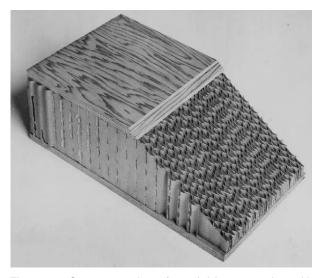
Cutaway section of sandwich construction with plywood facings and a paper honeycomb core.
